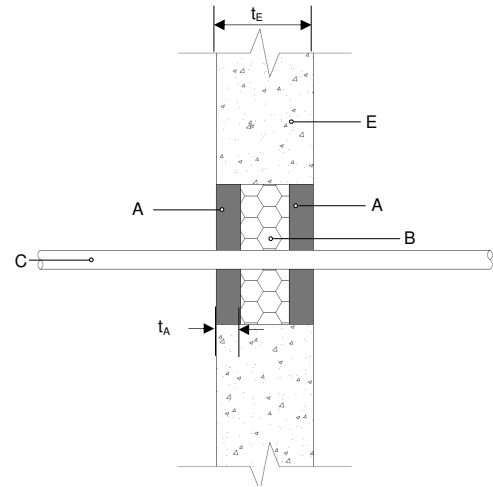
(b) - Details for PE-X Pipes in Rigid Walls greater than 100mm thick
